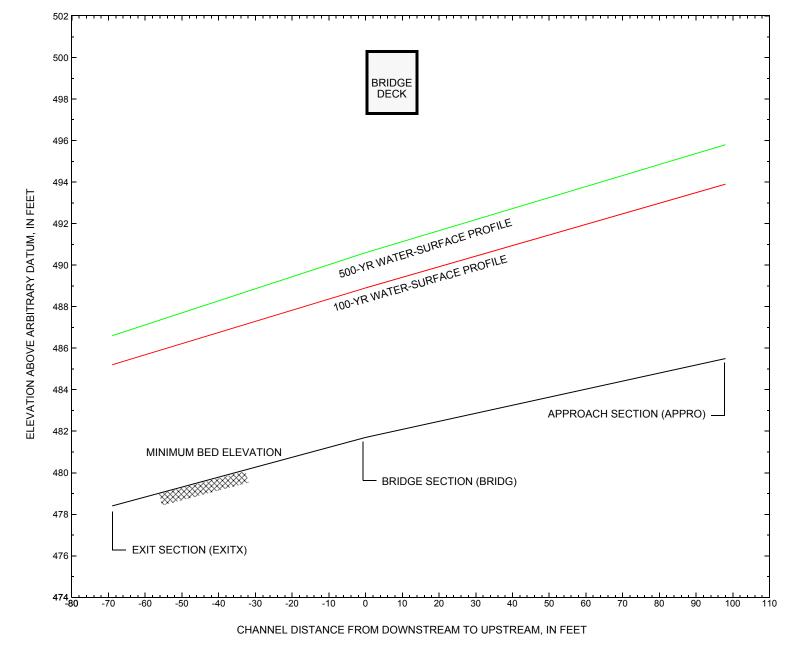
Water-surface profiles for the 100- and 500-yr discharges at structure JAMATH00300029 on Town Highway 30, crossing Ball Mountain Brook, Jamaica, Vermont.
